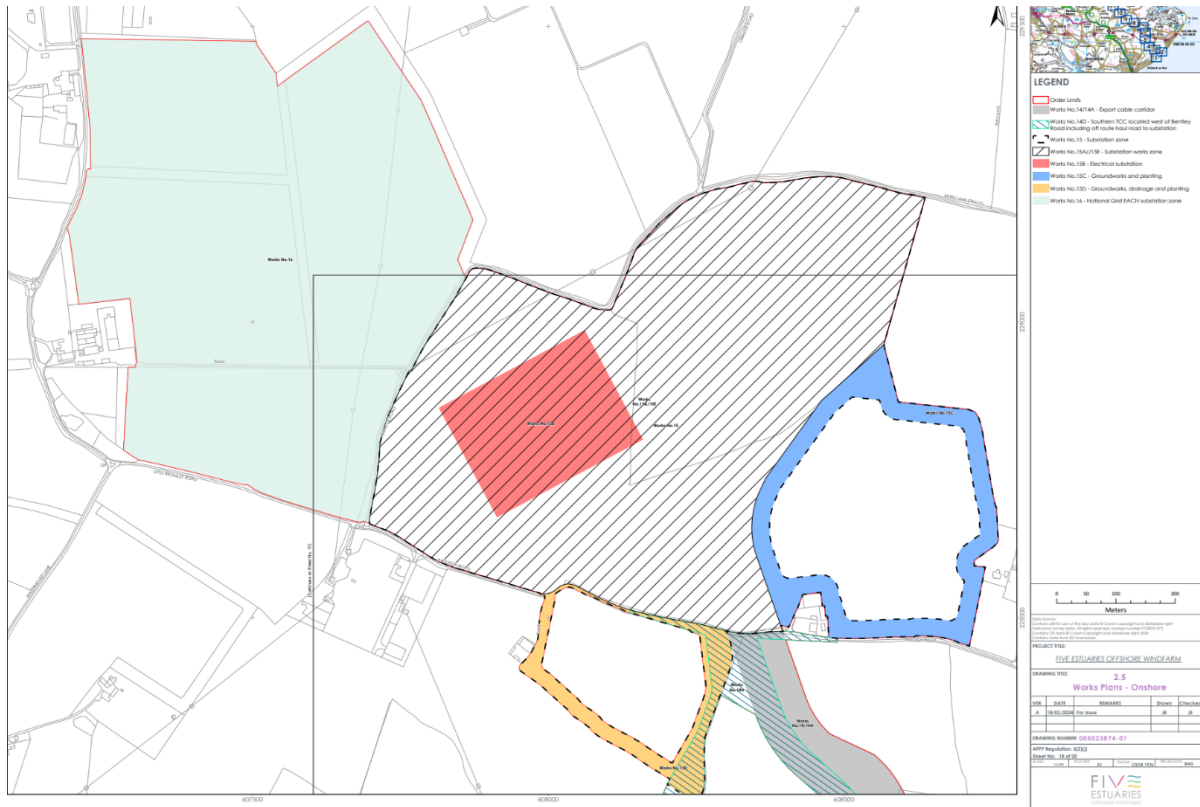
Outline Landscape and Ecological Management Plan: OnSS
